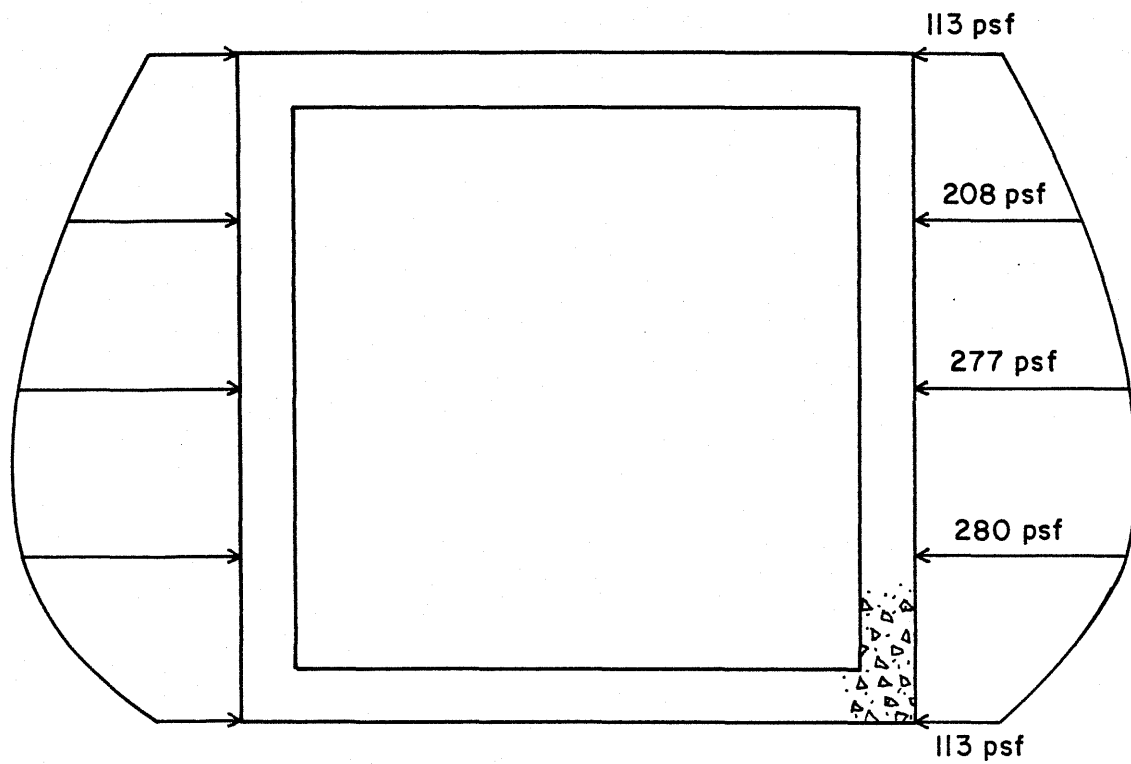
Horizontal Dead Load Pressures with Arching and Surcharge for Proposed Method (psf = 47.9 Pa)
